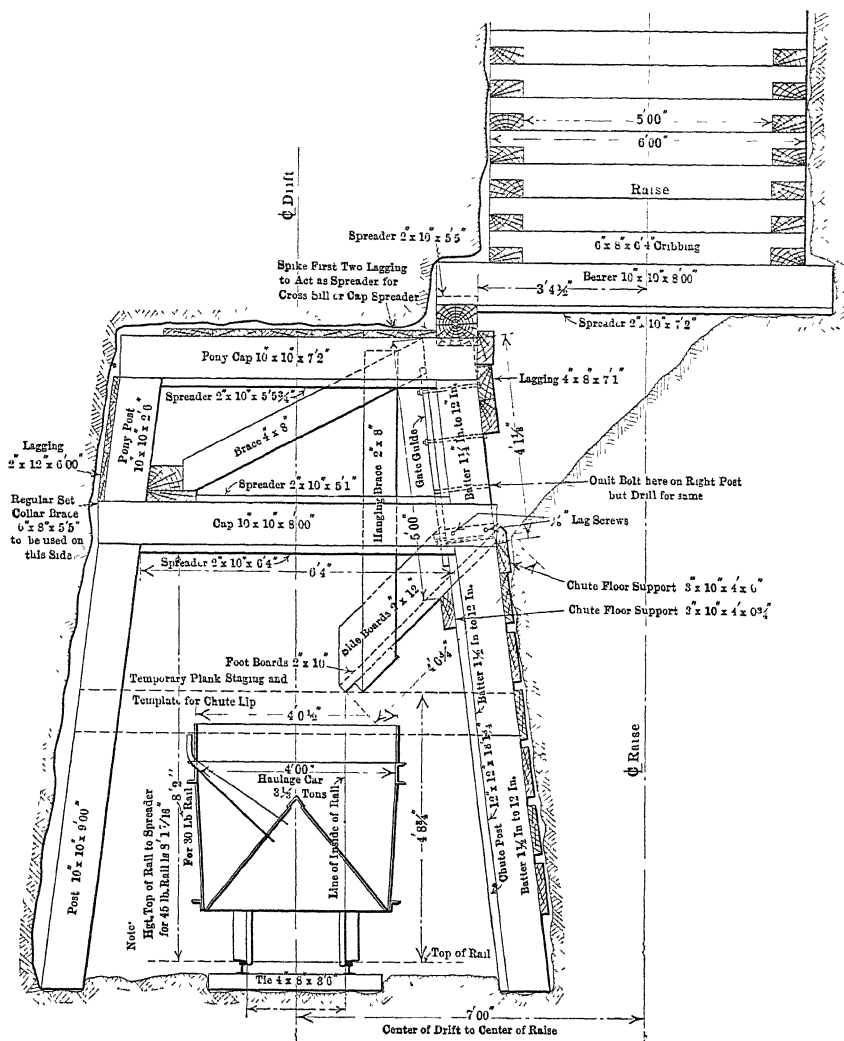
SECTION THROUGH DRIFT AND RAISE SHOWING TIMBERING OF STANDARD TRAMMING LEVEL CHUTE.
